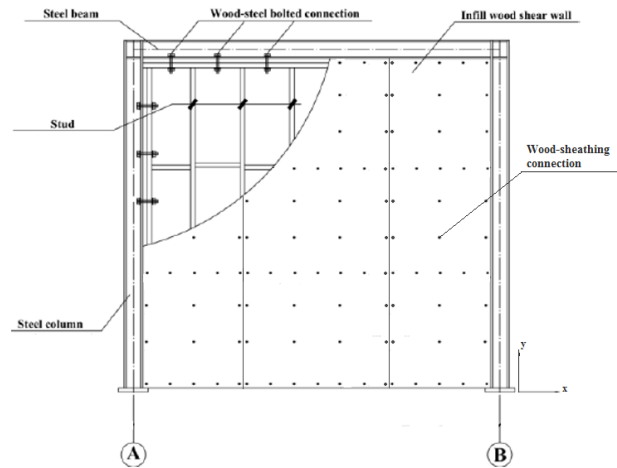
Configuration of a typical timber-steel hybrid shear wall
